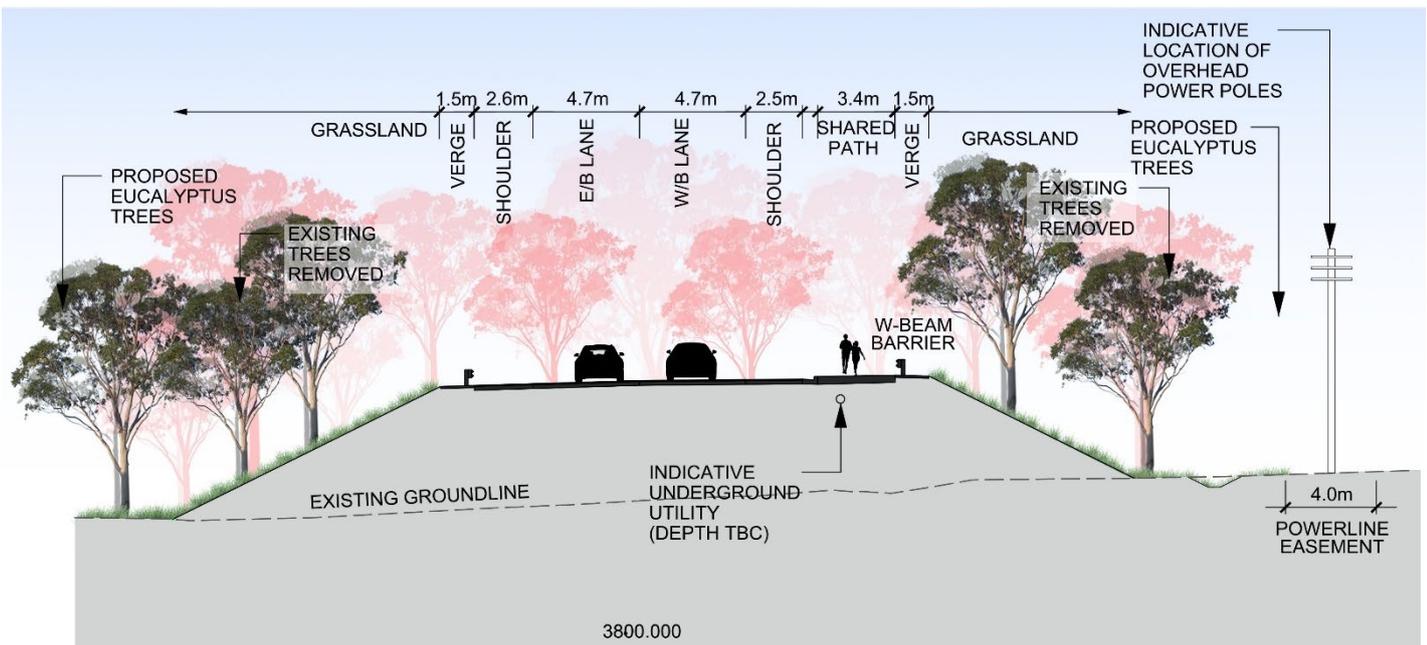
View of a section to be developed showing the shift in alignment from the existing Driftway to the proposed realignment to Racecourse Road
